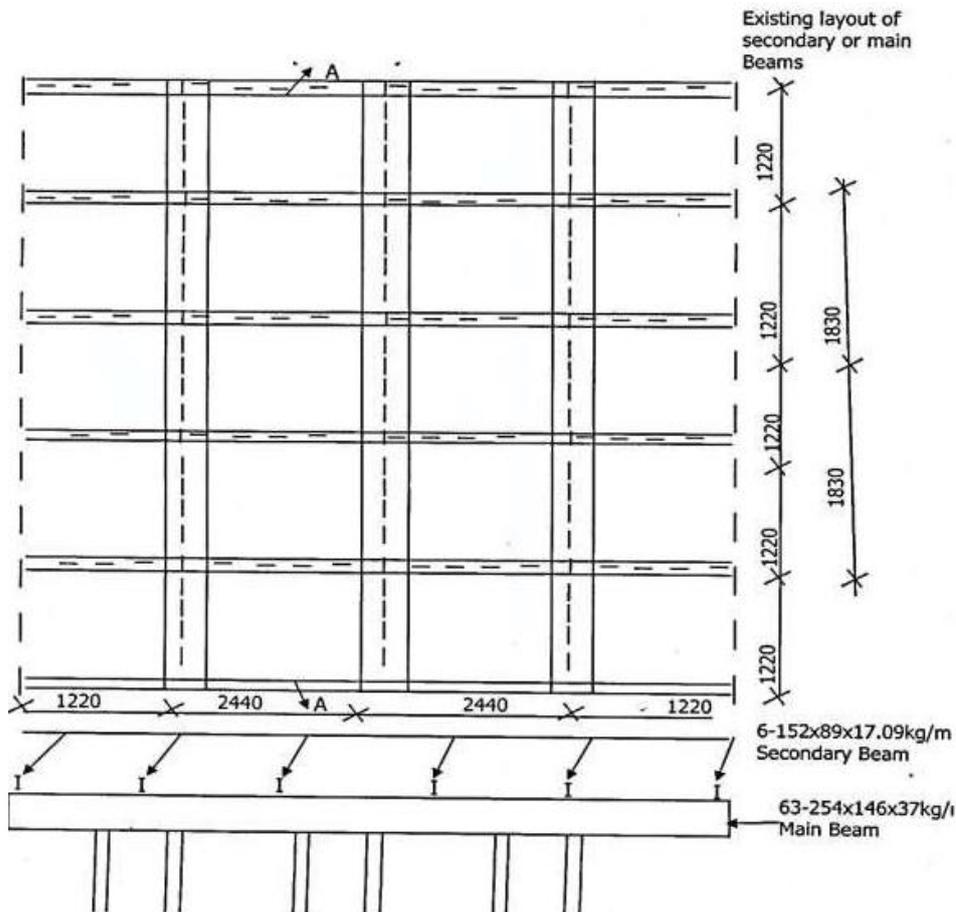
Showing the plan for the supporting tower for an existing elevated Braithwaite Prestressed Steel Tank.
